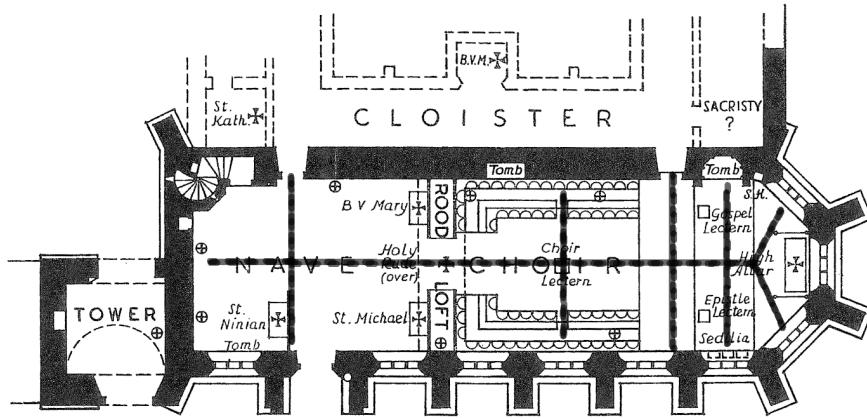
Floor plan of St Salvator's chapel, with IPS routes.
